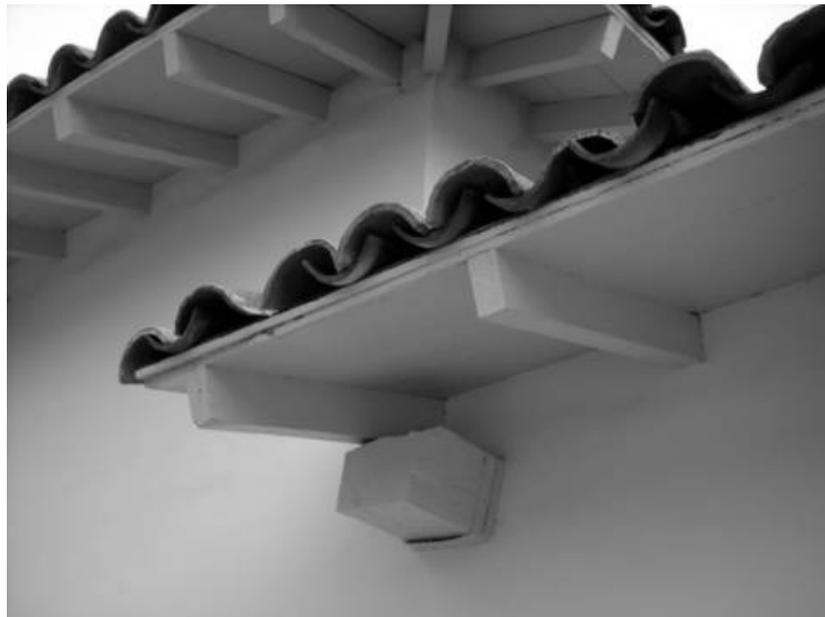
Eave detail, Custom House, showing good maintenance of structure and finishes. Photo by author.
